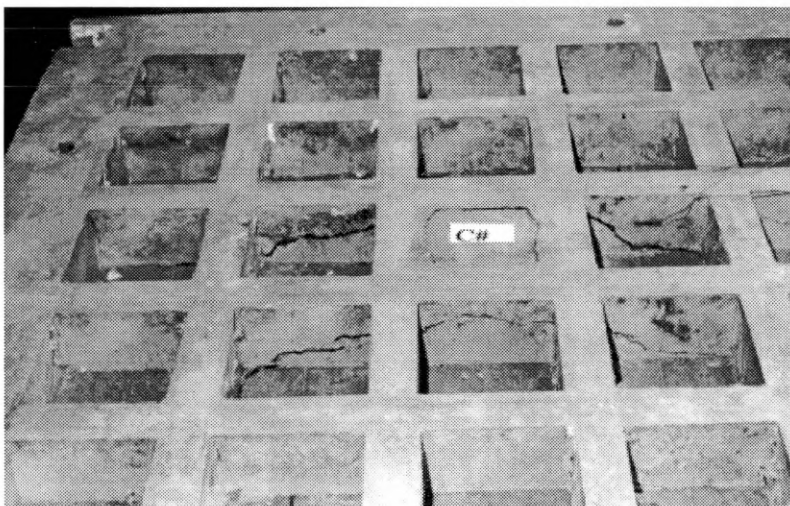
(c) Crack pattern after punching failure — slab No. 3
